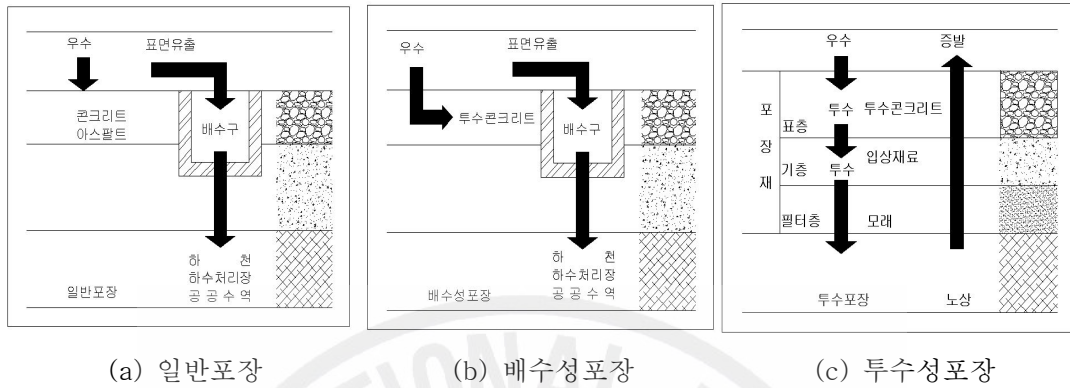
The rainfall flow of porous pavement & drainage pavement
